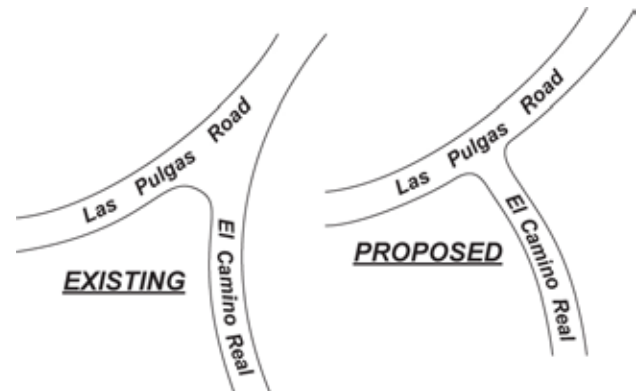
Proposed redesign of Las Pulgas Road and El Camino Real intersection near the Las Flores Ranch House.
